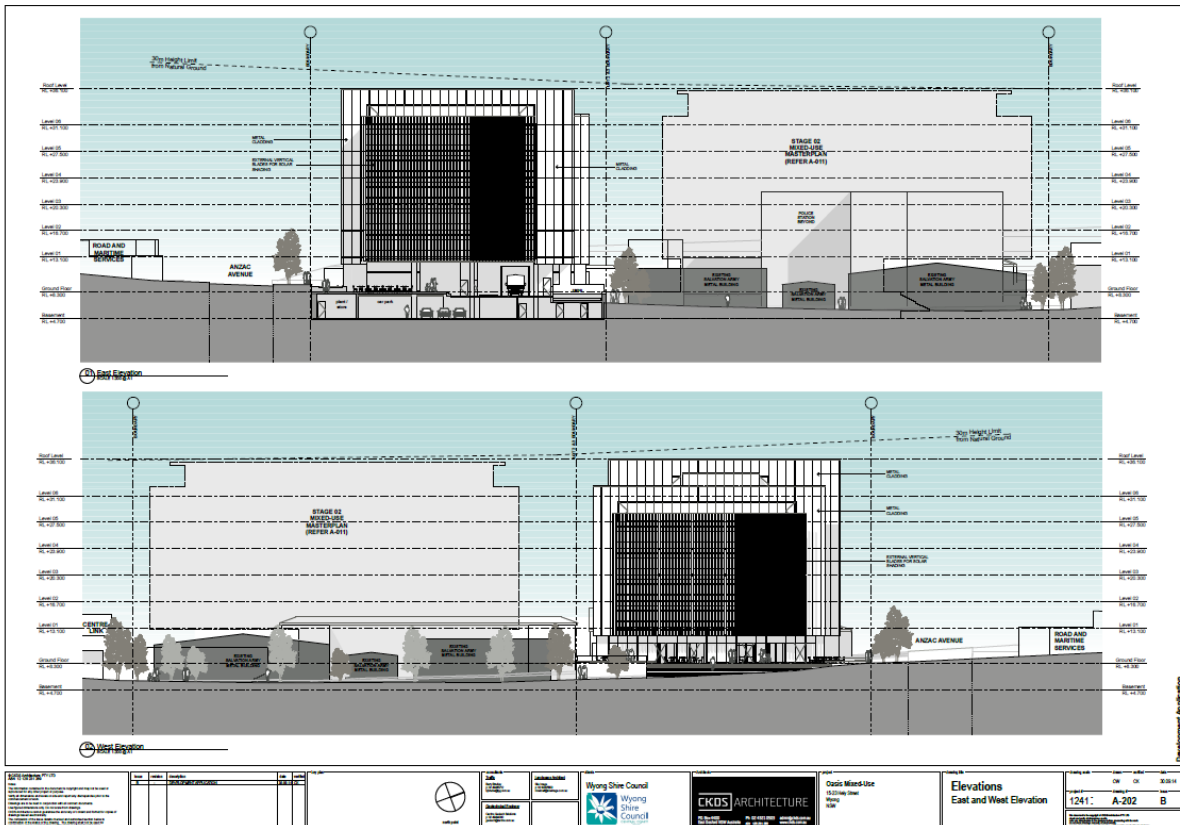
East and west elevations of proposed Stage 1 mixed use commercial and retail development.
